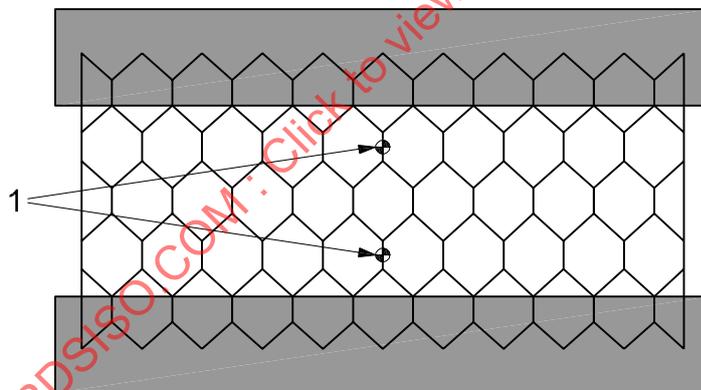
Example of geogrid with three axes, specimen size, width and gauge length CMD
